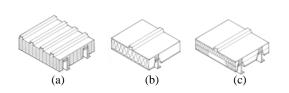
(EN3) Prefabricated metal roofs showing thermal blocking of purlins.
